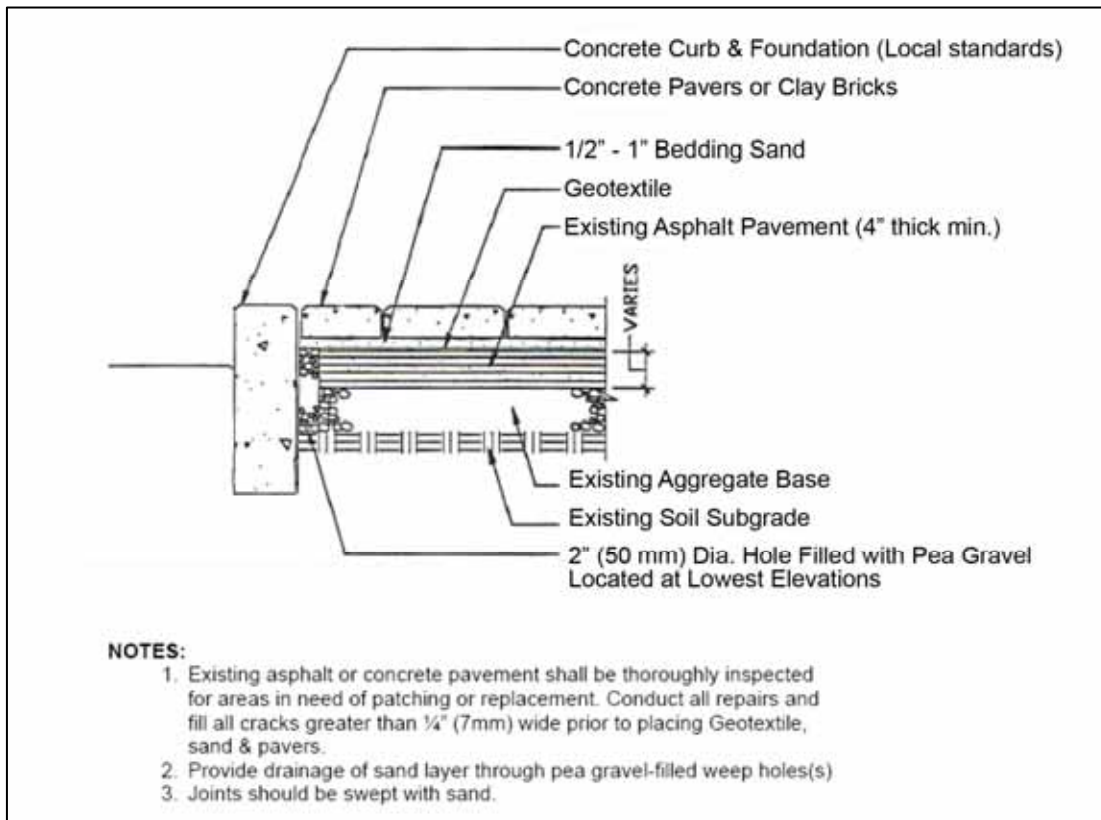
Concrete Pedestrian Pavers Installation – Sand Set over Asphalt
